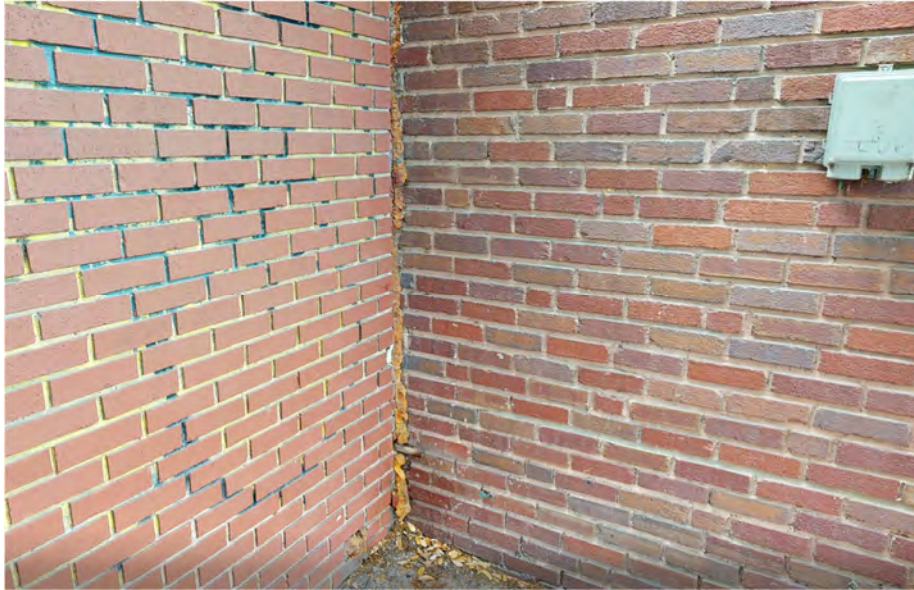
Entrance Addition on the left and Education Building on the right. Note the construction joint between the structures, different brick material, and misalignment of mortar joints.
